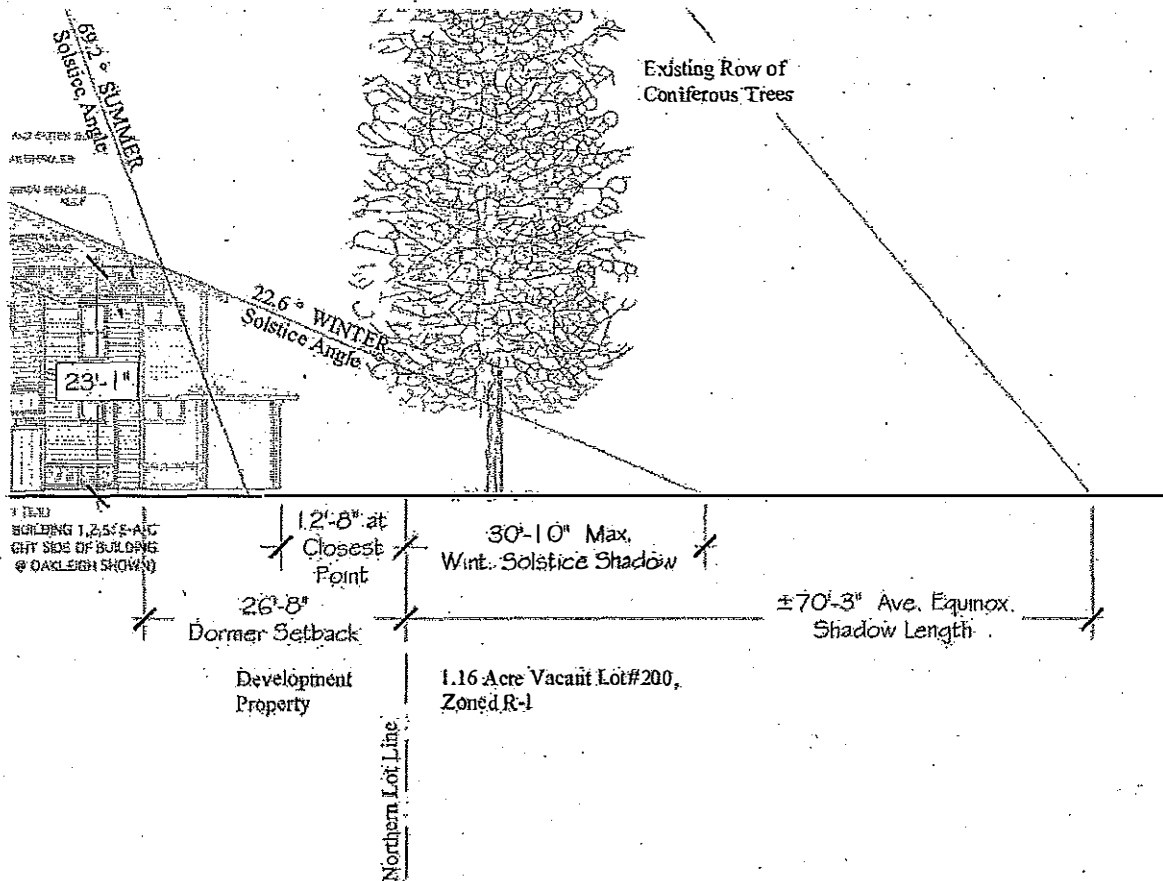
Solar Section of Building 2 showing the proposed building setback and effective shadow lengths relative to adjacent property lines and existing natural features.
